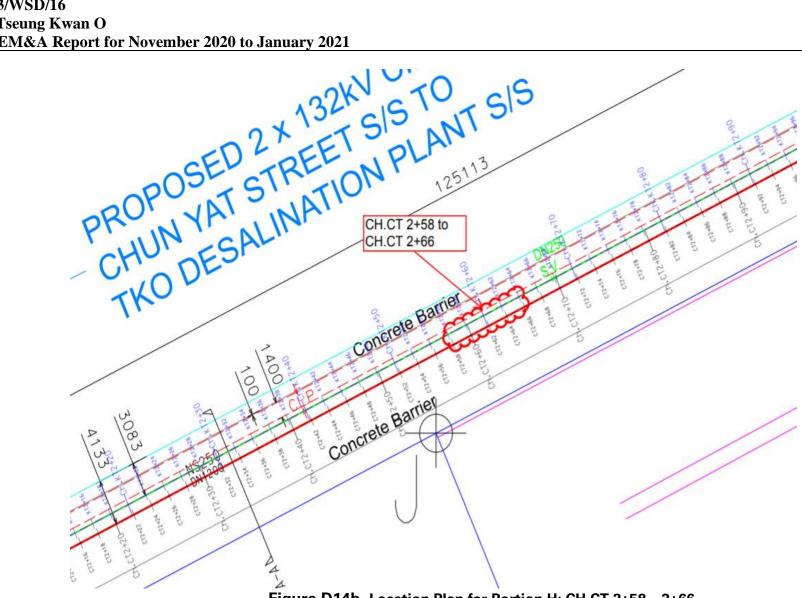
Location Plan for Portion H: CH.CT 2+58 - 2+66
